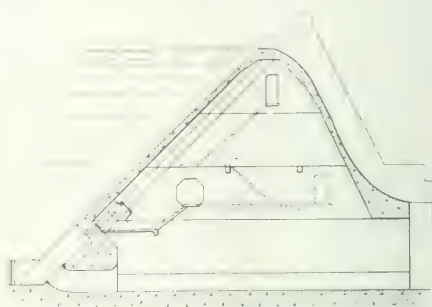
Cross-Section of Hollow Concrete Dam at Sluice-Gate Bay.
